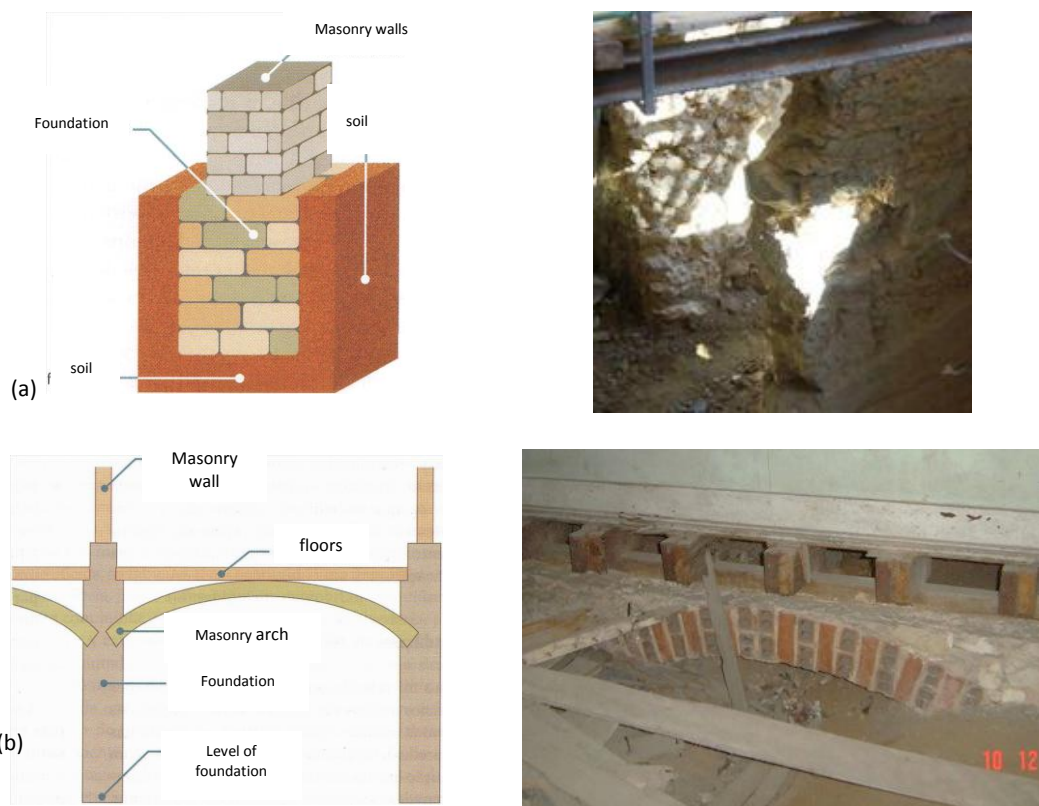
Types of foundations. a) Direct foundations; b) Semi-direct foundations using arches.
